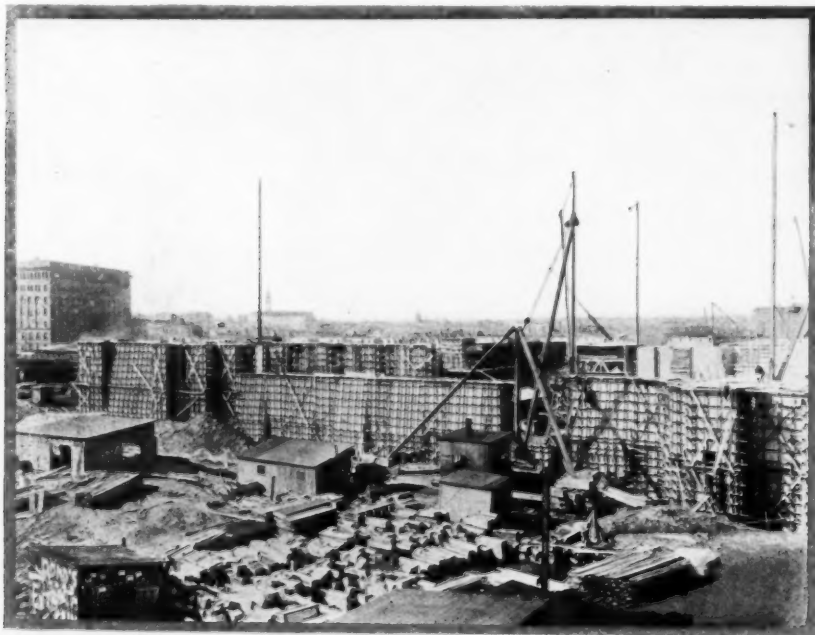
THE WASHINGTON TERMINAL UNDER CONSTRUCTION.
